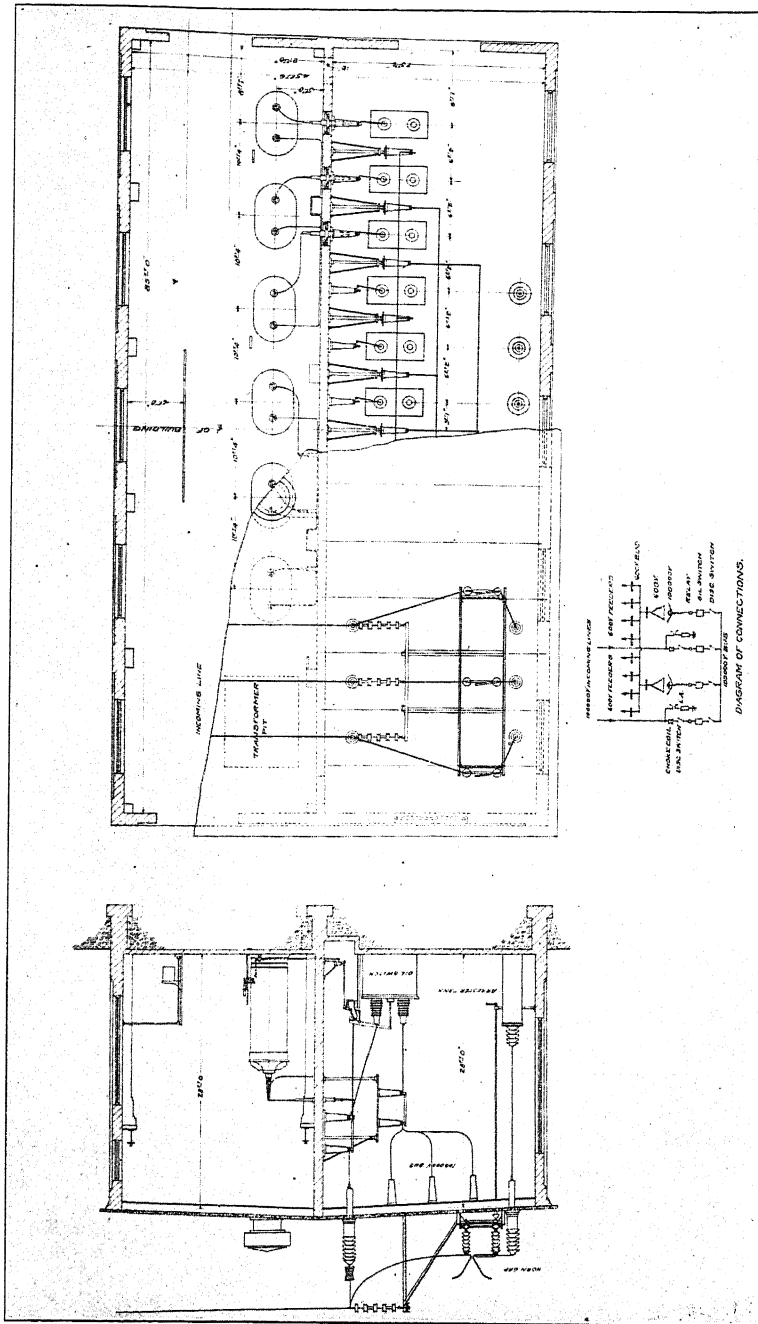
General arrangement of 2400-kw., 100,000-volt transformer sub-station.
